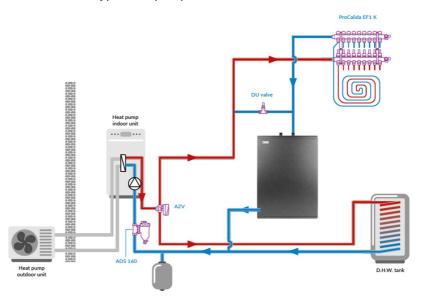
Buffer tank ABT 50 used in surface heating instalation with split type heat pump.
